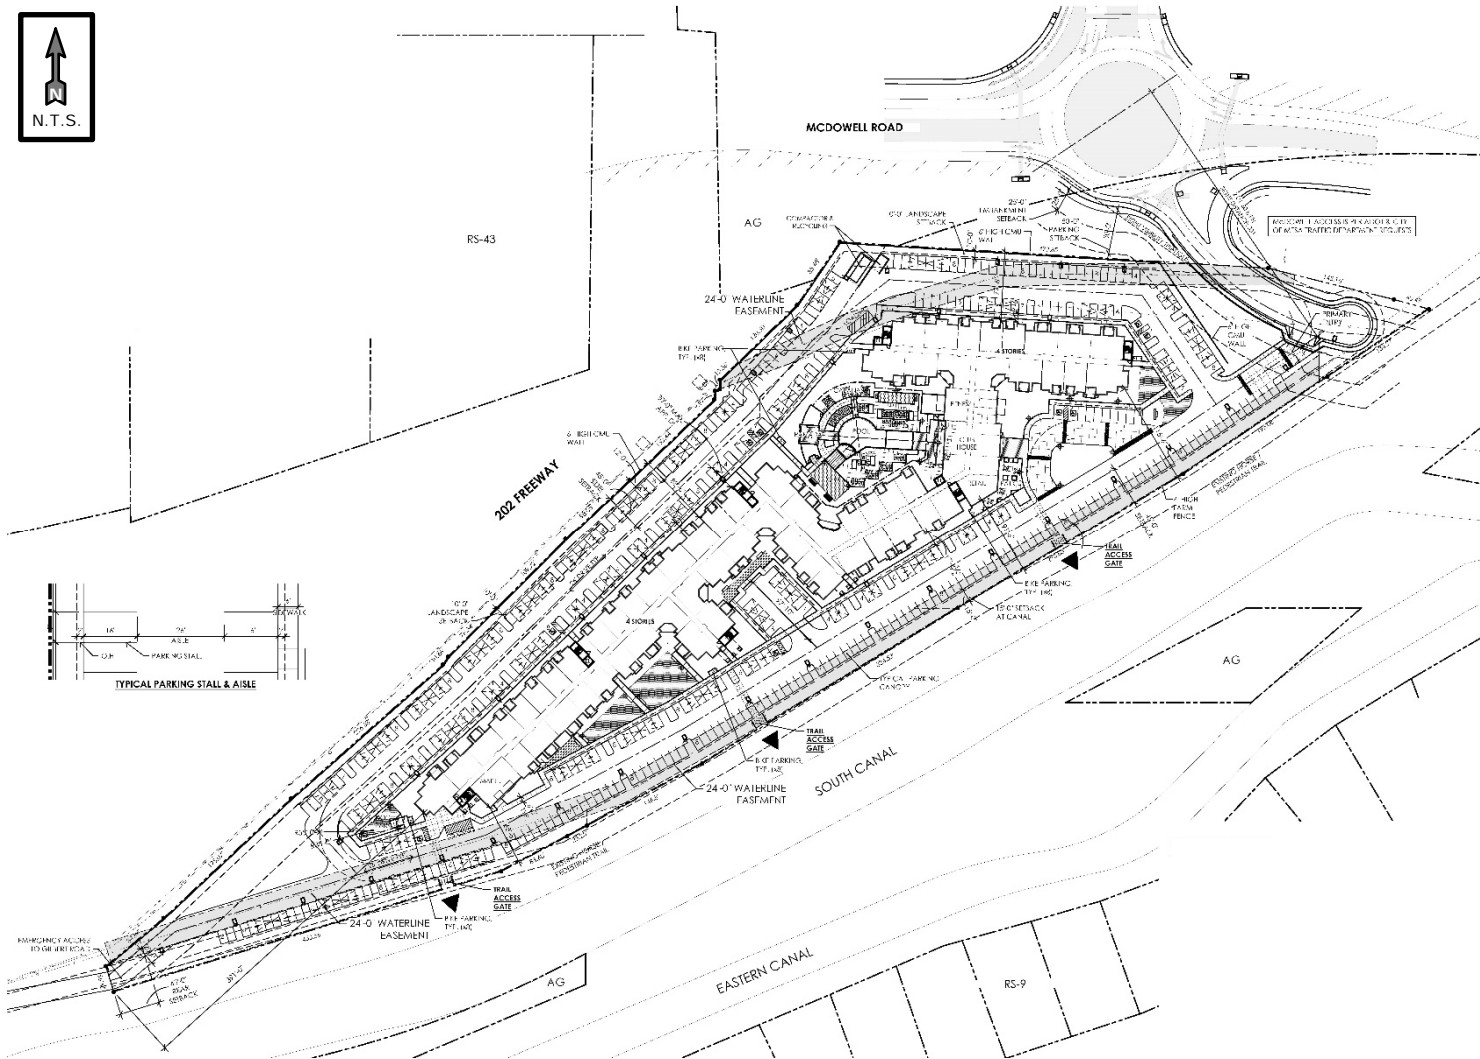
provides the proposed development site plan. The planned multi-family development will consist of several different unit types including:
